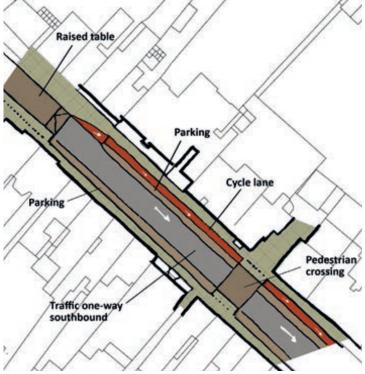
New street design to integrate on-street parking on St Owen's Street
